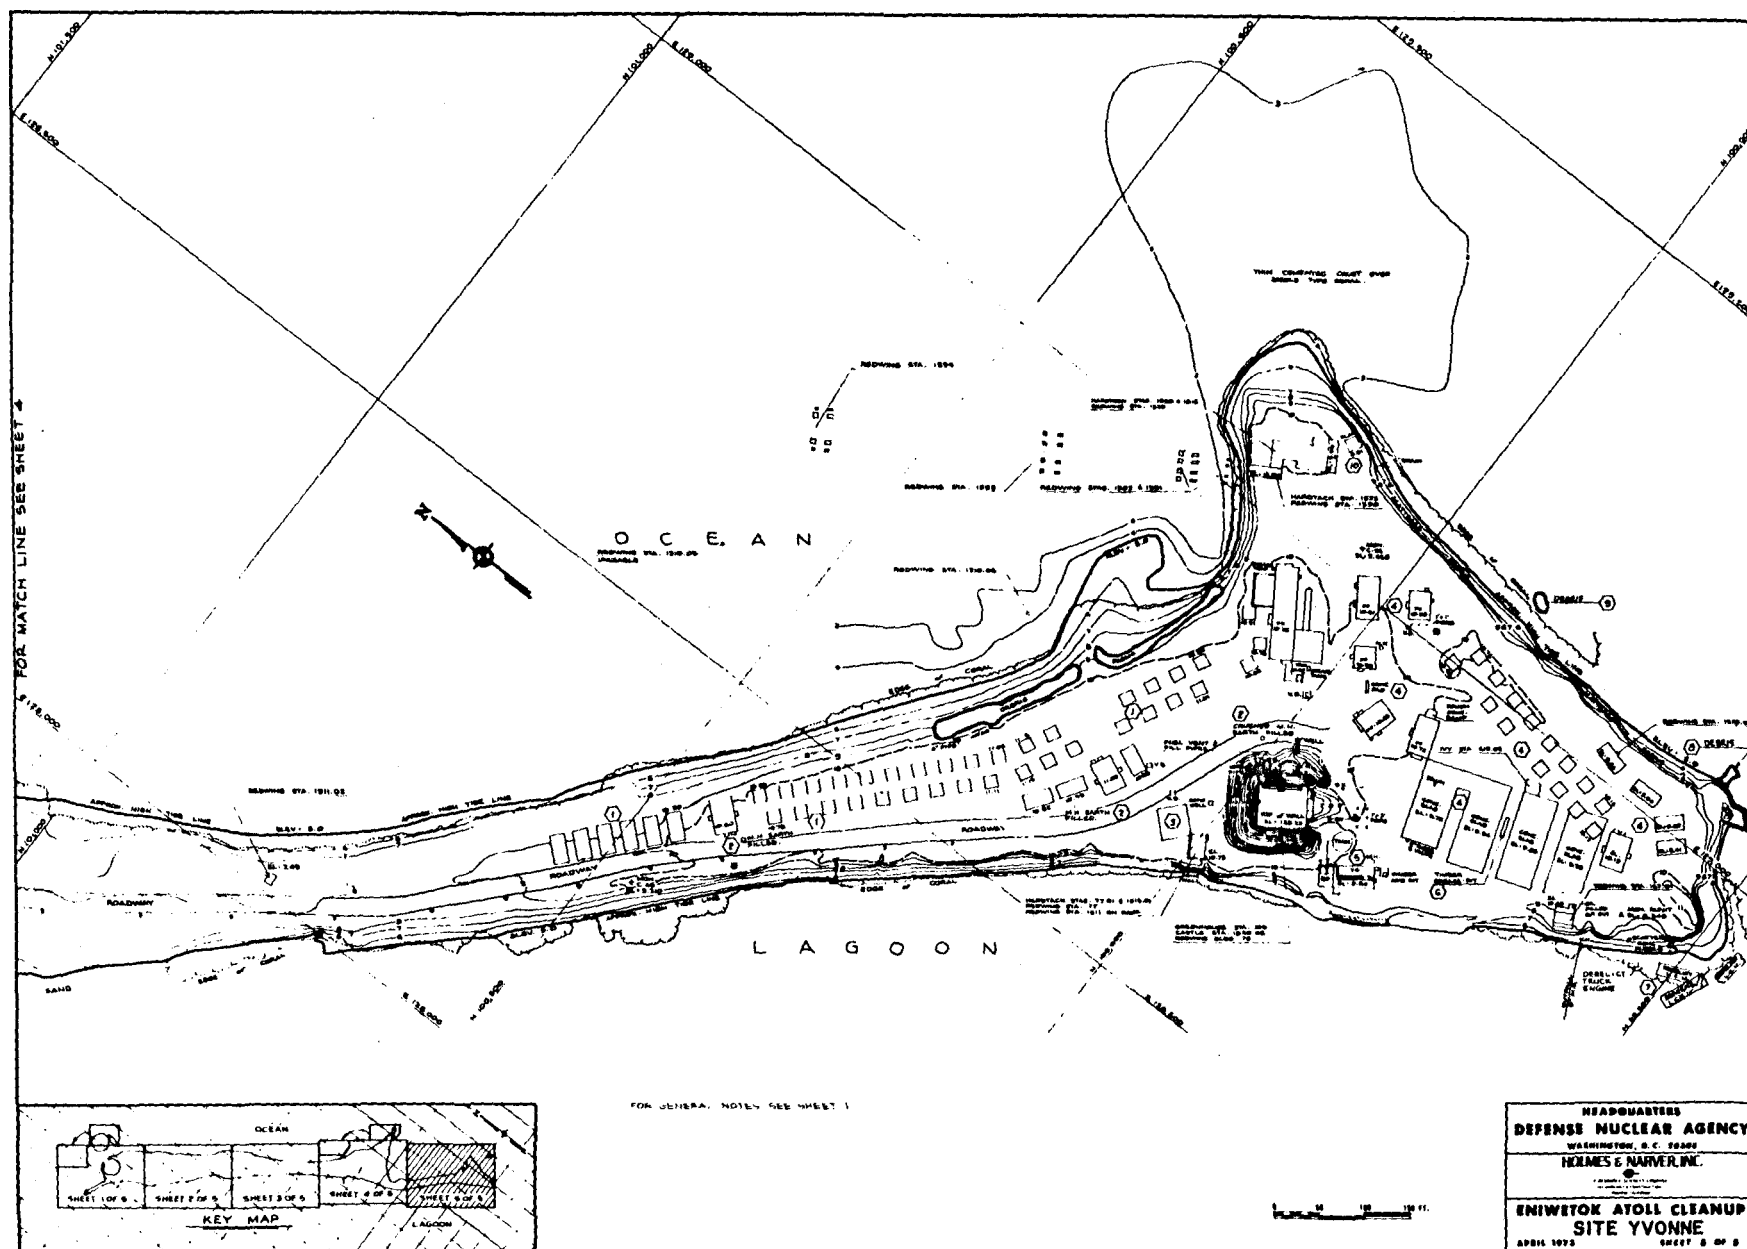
SITE YVONNE, SHEET 5 OF 5
